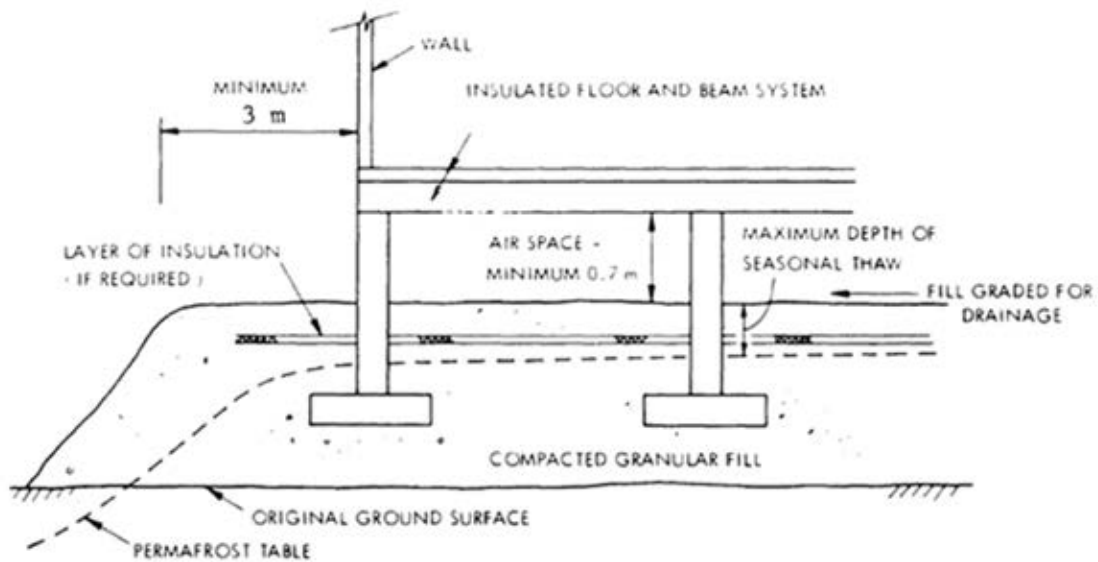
Typical shallow foundation footing in permafrost, embedded in a thick, insulated gravel pad placed on the ground surface (after Johnston 1981)
